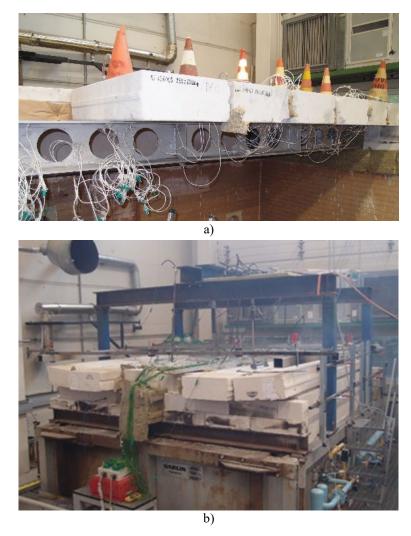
a) Beam and slab construction during installation; b) Test set-up during the test.
